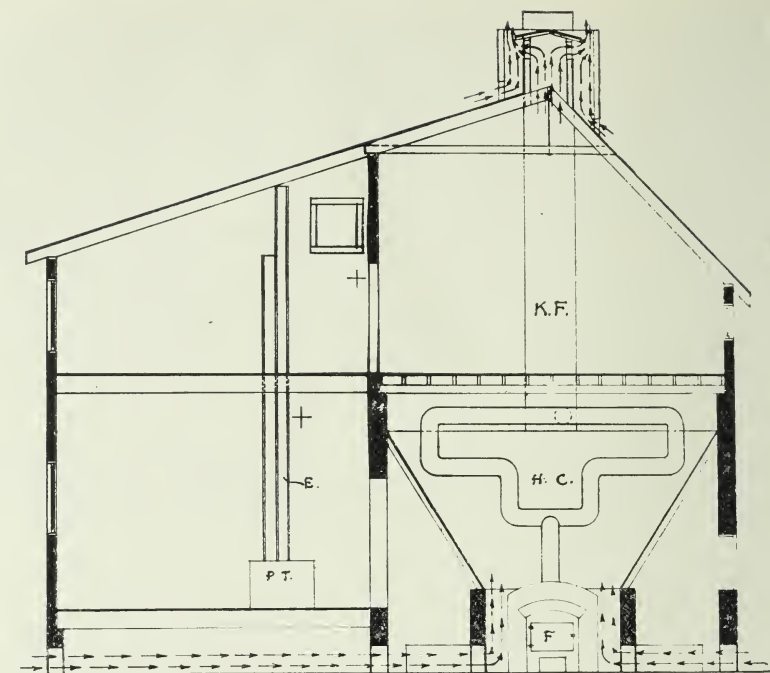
Fig. XV. Sectional end view of building, showing jacket-and-hopper construction. F, furnace, enclosed by jacketing wall upon which base of hopper rests. H.C., coils of piping. K.F., kiln flue. Paring table and elevators for apples and waste, position of bleacher, and location of shafting are also indicated, as is the construction of the ventilator.
